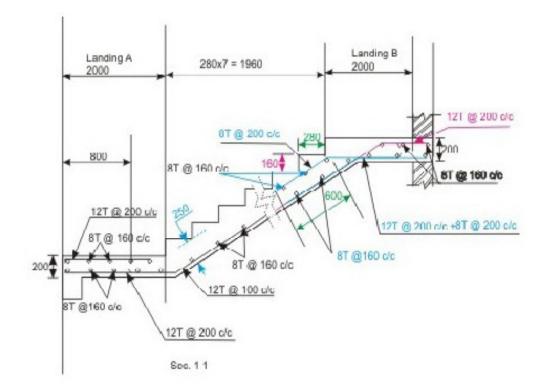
Reinforcing bars, sec 1-1 of Fig 9.20.21, Example Q.8
